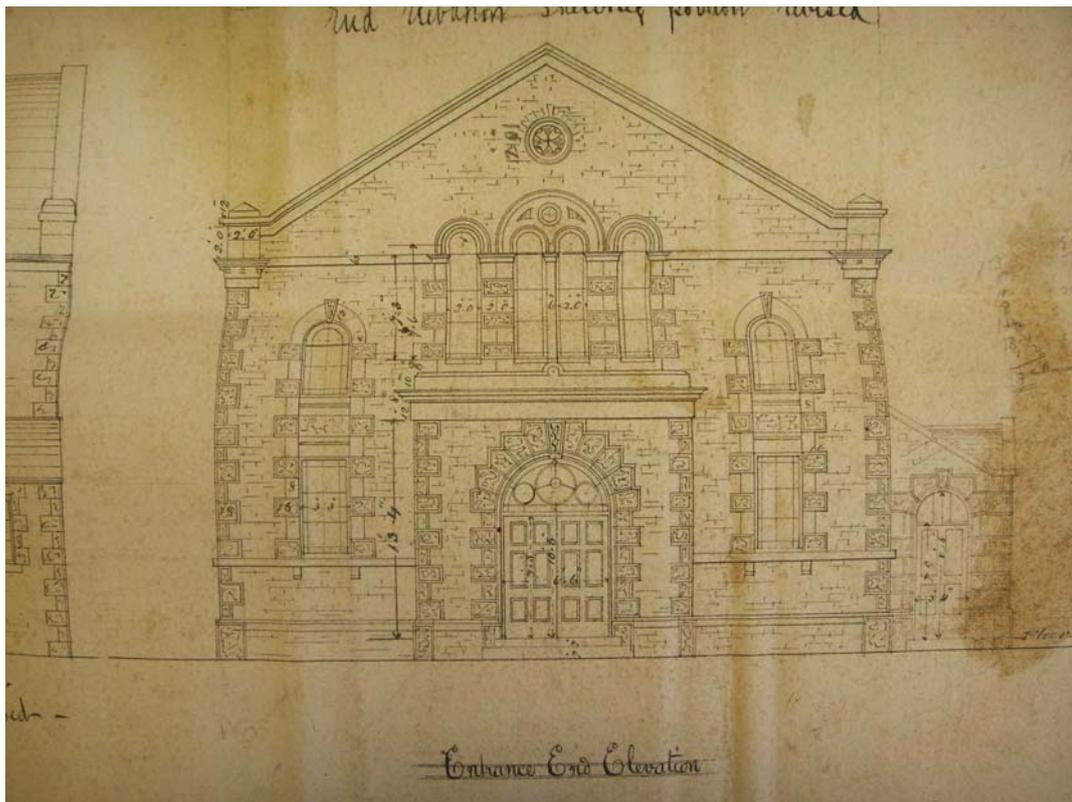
East external elevation as proposed in original drawings of 1872 (CRO (B) Z1099 1872)
